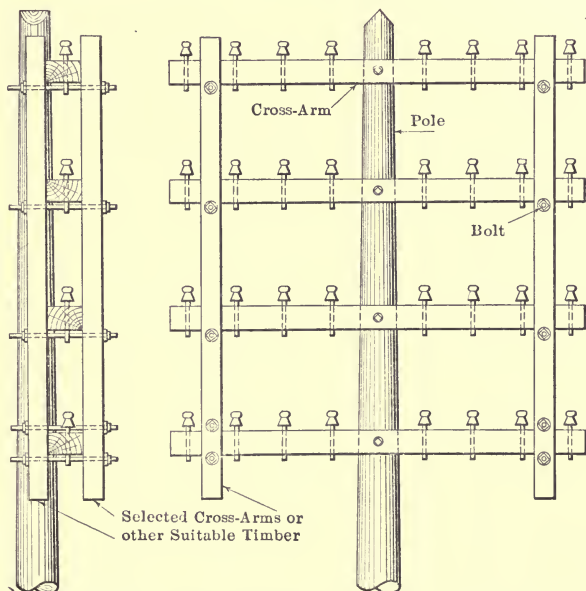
TEMPORARY CROSS-ARM BRACES TO AID CONSTRUCTION CREWS.
